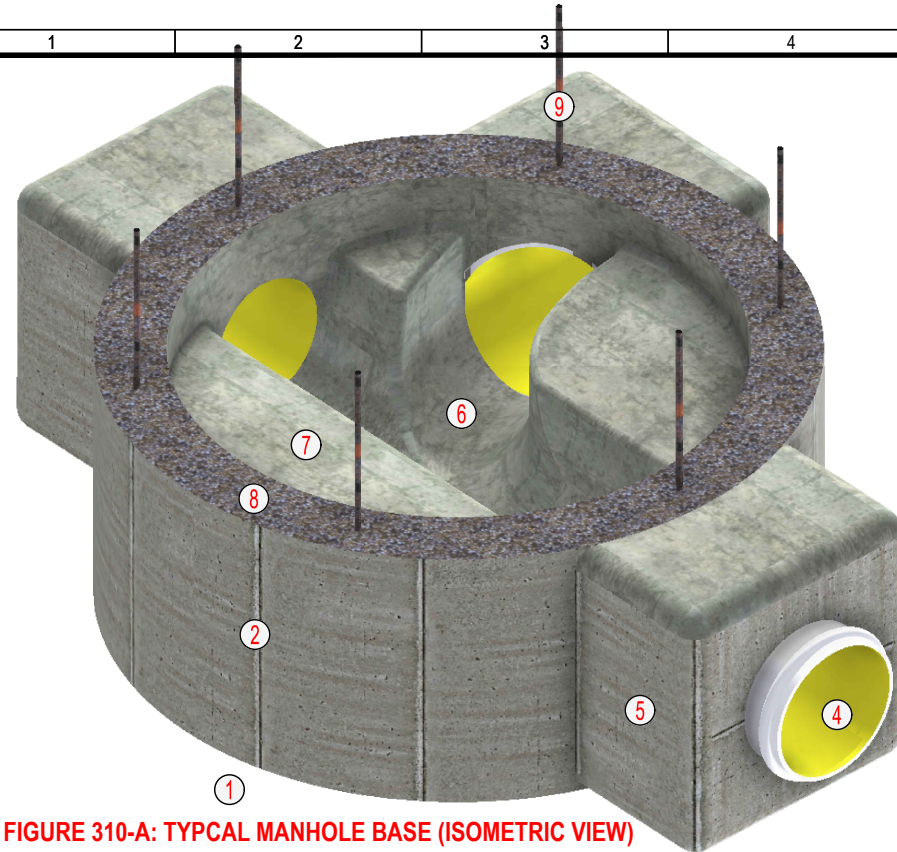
A: TYPICAL MANHOLE BASE (ISOMETRIC VIEW)
